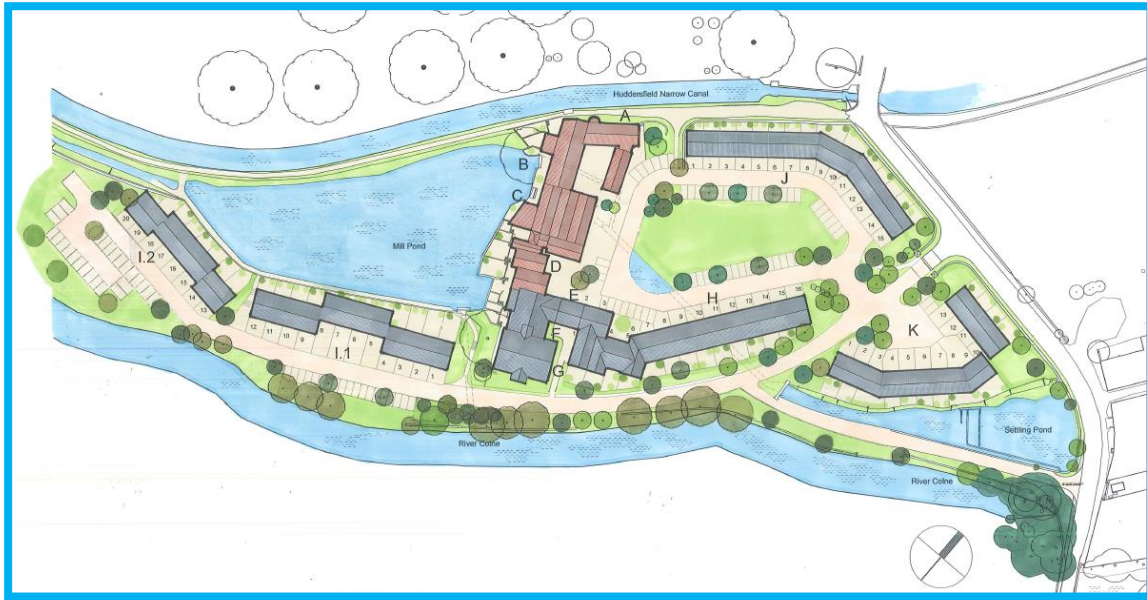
Proposed layout showing the reuse of the Mill building, and the new terraced houses to the east and west.
